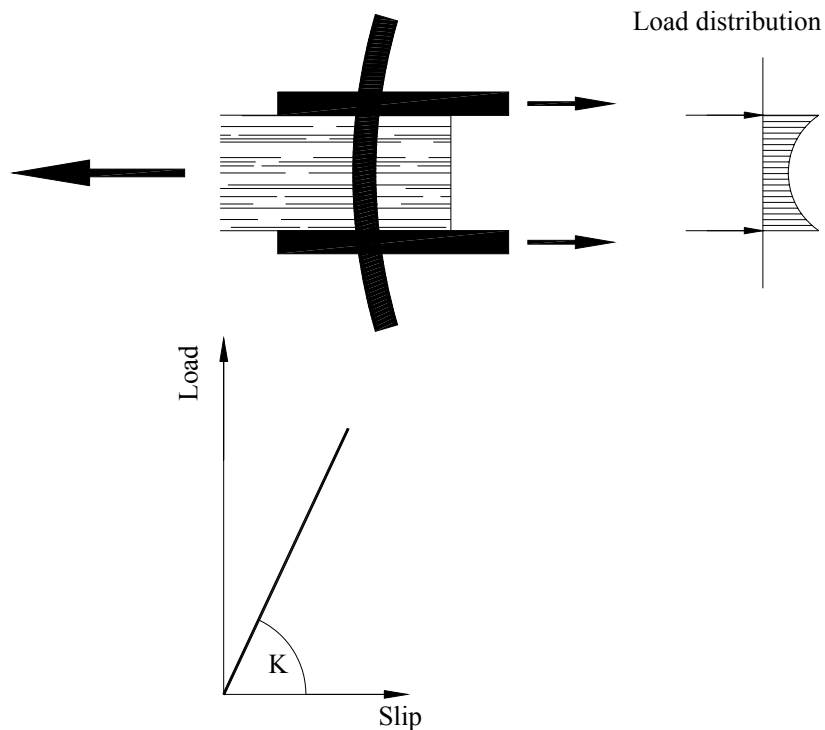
Fastener behavior as assumed by Cramer (1968)
